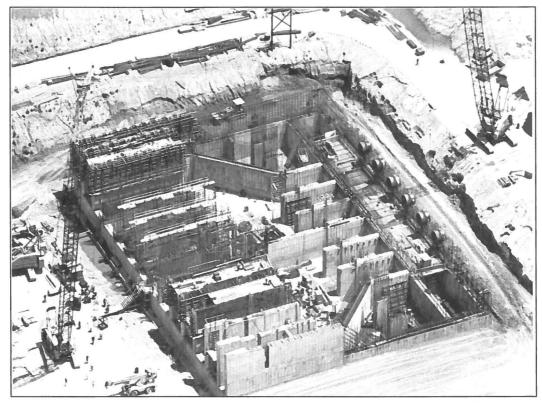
Construction Photograph of the CPS Site, 1977
